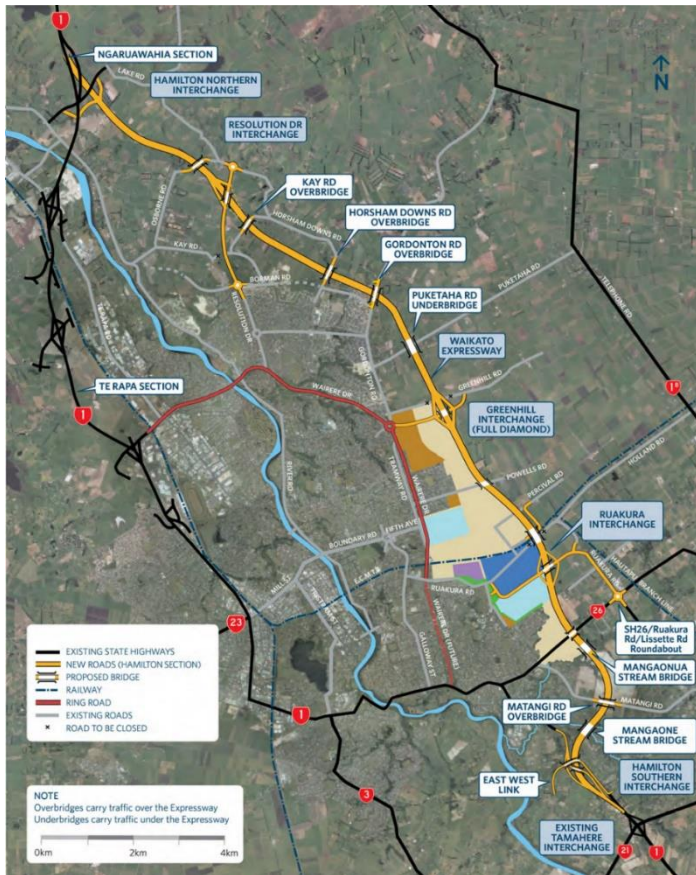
Plan of Hamilton Section of Waikato Expressway showing major structures
